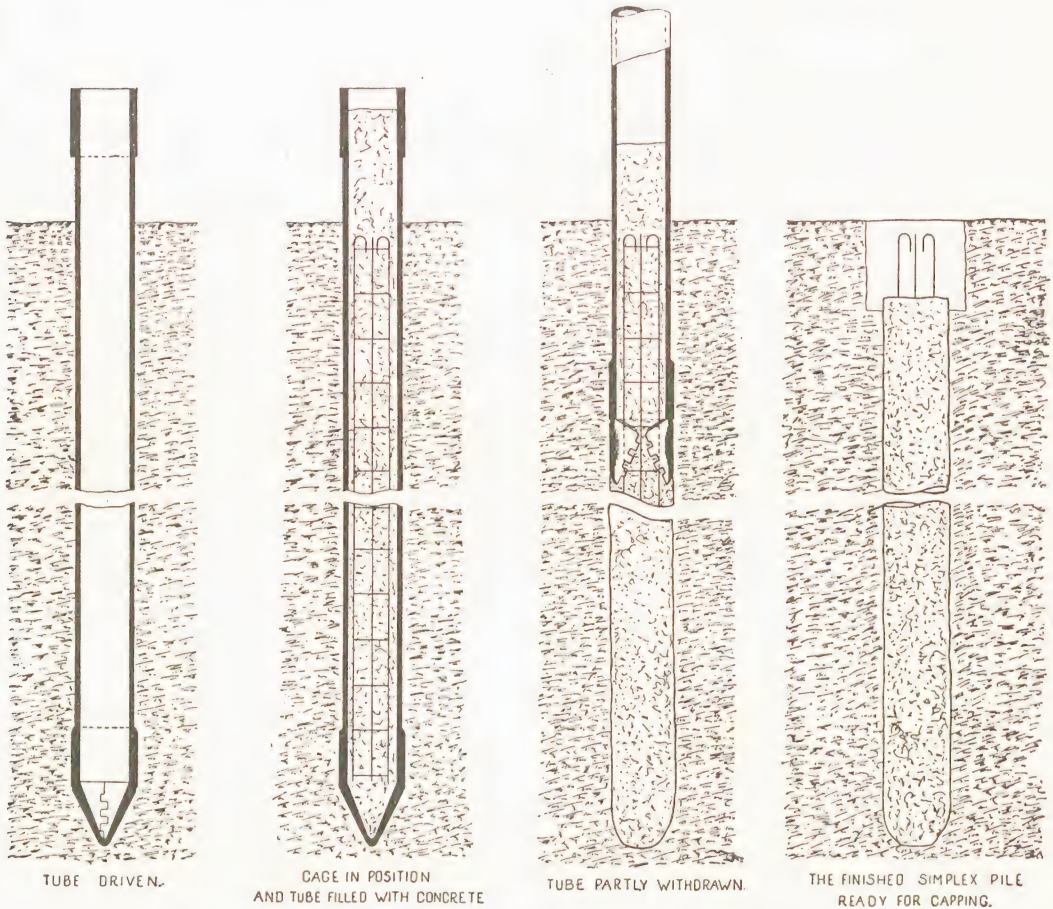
Method of installing Simplex Concrete Piles with alligator point.
